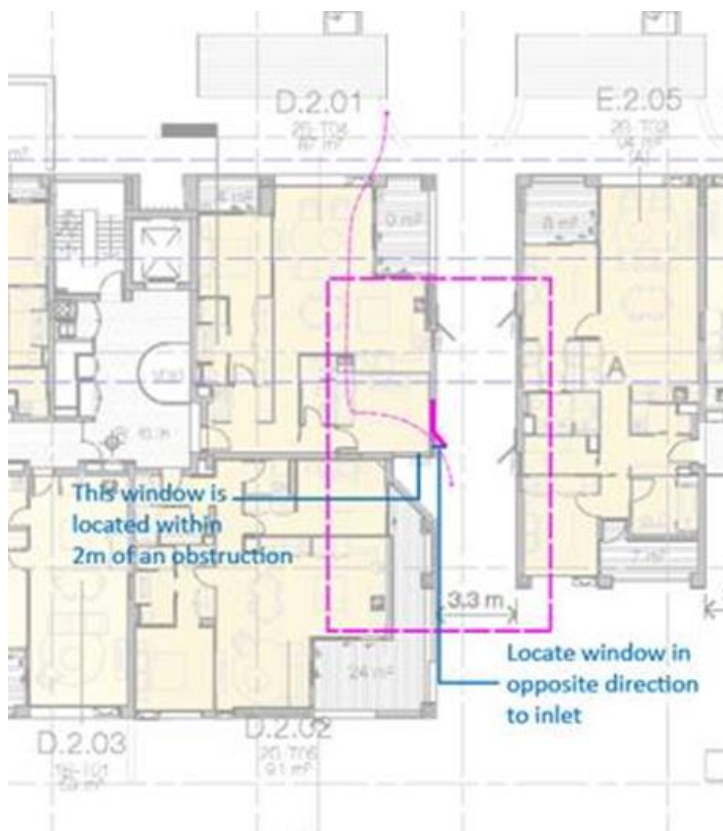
Plan of Building D and Building E wings depicting cross ventilation solution
